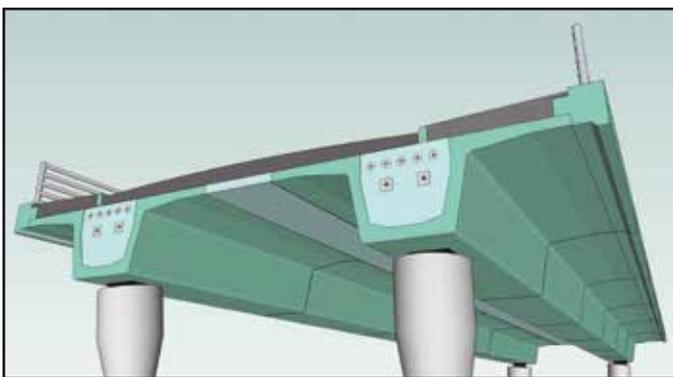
Modular Precast Bridge - with permanent, participating formwork.
